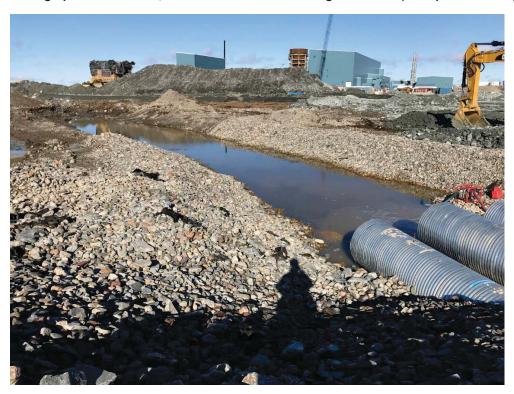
Channel 1, Looking Upstream Northwest Towards Culvert 16 (13 September 2018)
